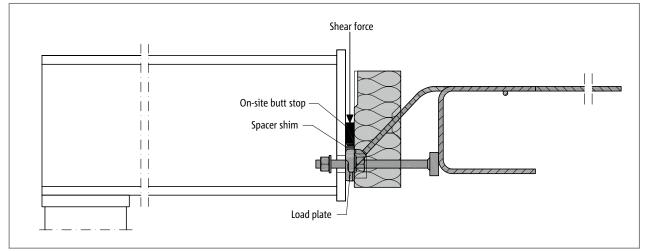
Schöck Isokorb® T type SQ: On-site butt stop for transferring shear forces
